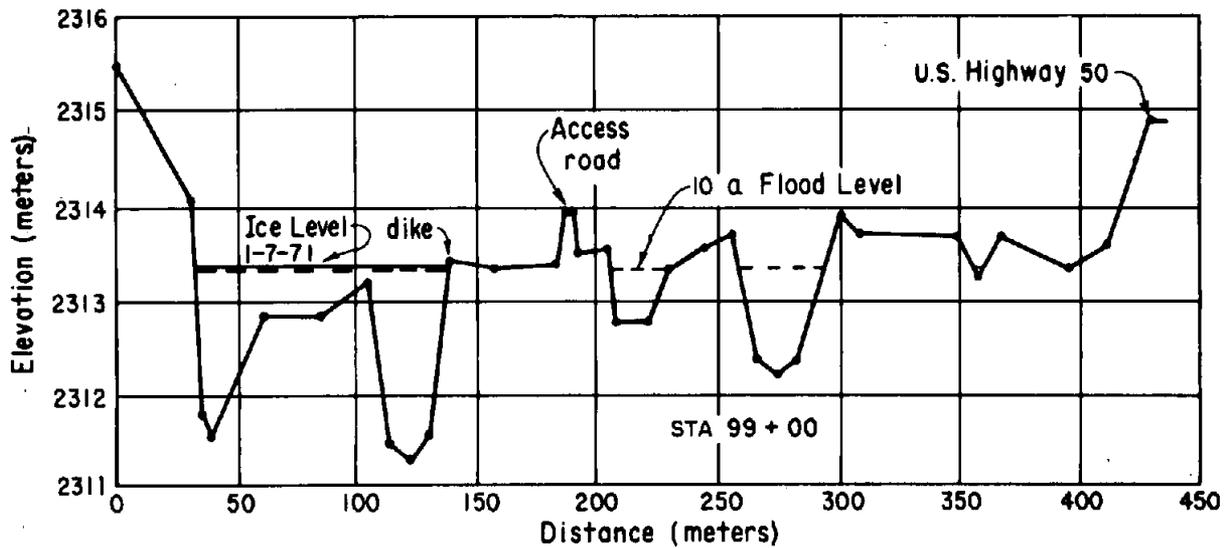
River cross section at Moncrief's Foot Bridge (facing downstream).
